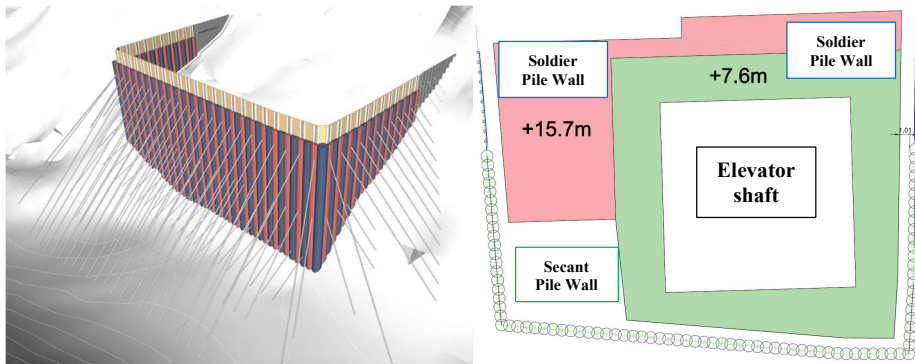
Lay-out of the secant pile wall, the soldier pile wall and rock foundation.
